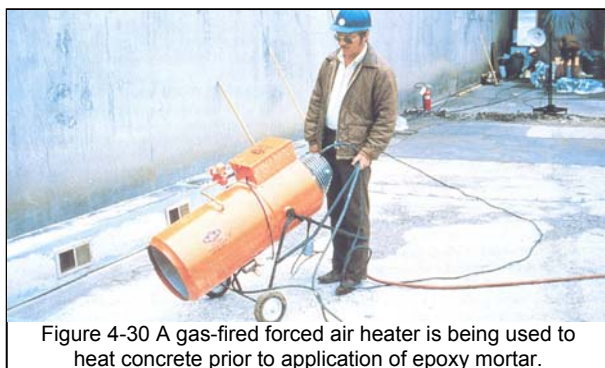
A gas-fired forced air heater is being used to heat concrete prior to application of epoxy mortar.
